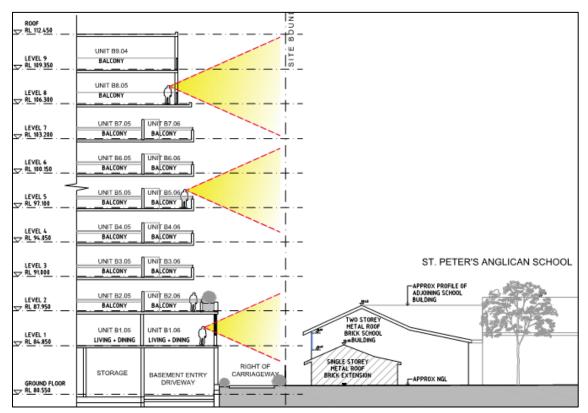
Location of building showing overlooking potential to adjoining school buildings and playground
